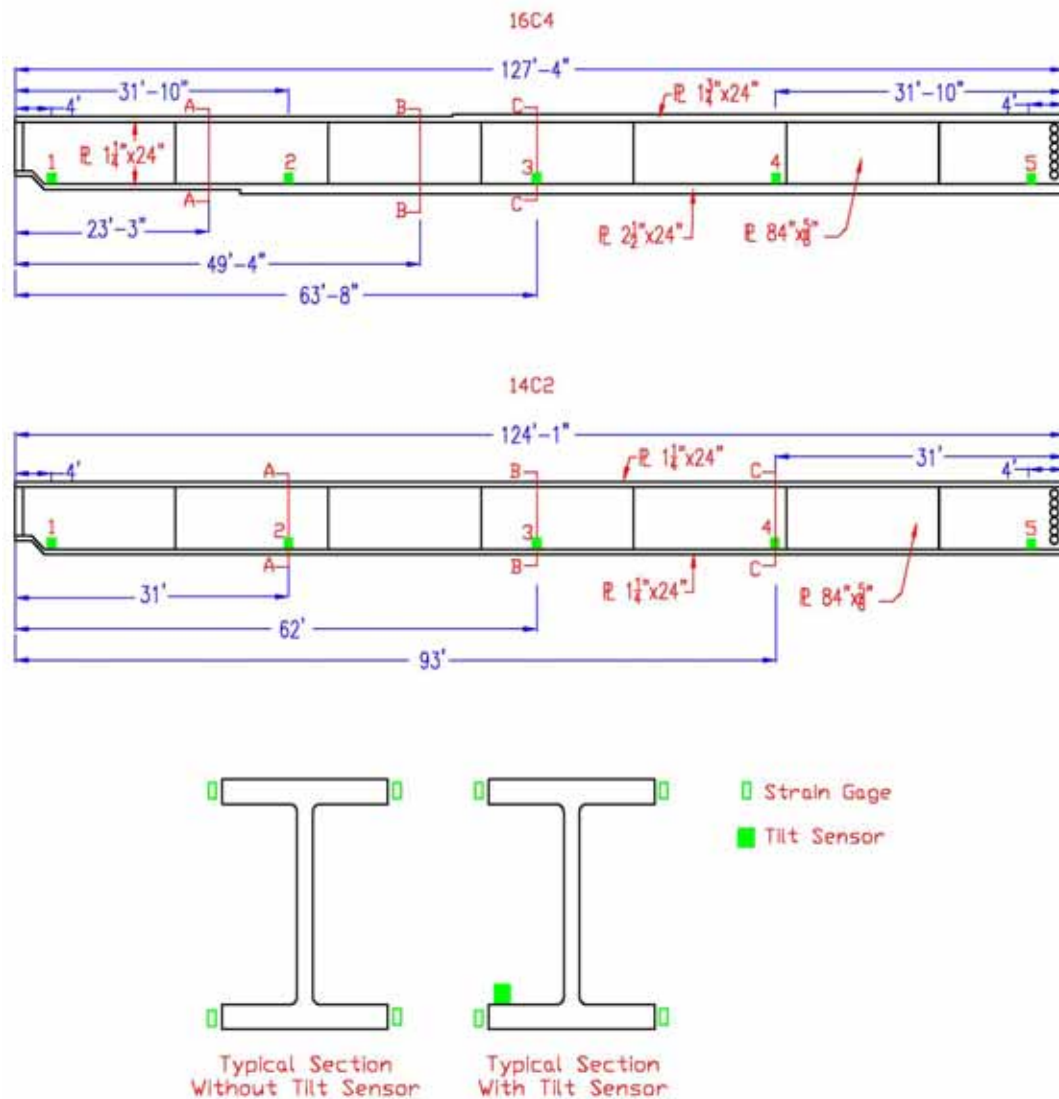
Hirschfeld Girder Elevations w/ Gage and Tilt Sensor Locations
